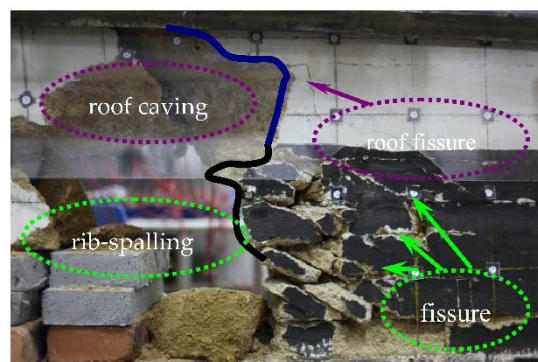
Development of joint and instability form the coal wall rib-spalling ($\alpha = 150^\circ$).
